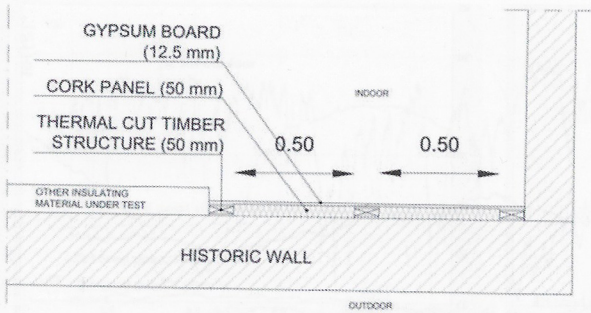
Horizontal section of the historic wall internal insulated with the cork panels system.
